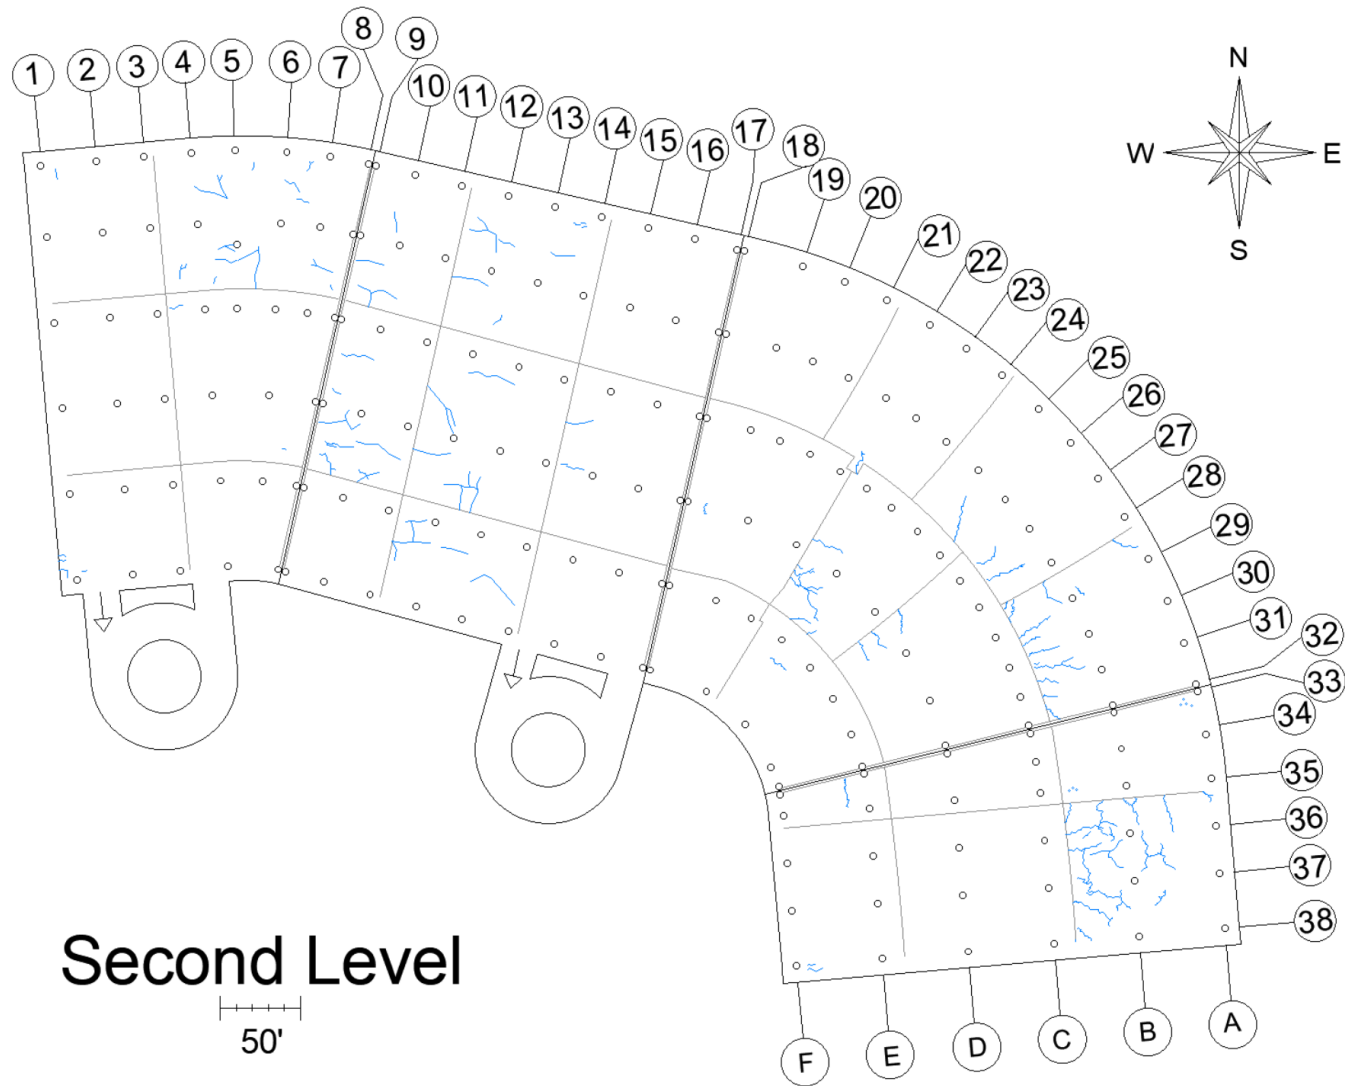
Crack map of silica fume concrete suspended, reinforced second floor with blue top-down cracks, gray epoxy-filled construction joints, and no locations of visually exposed rebar.
